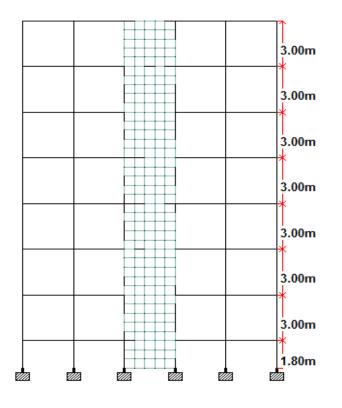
Elevation of a steel frame building with SPSW(Mesh frame model)
